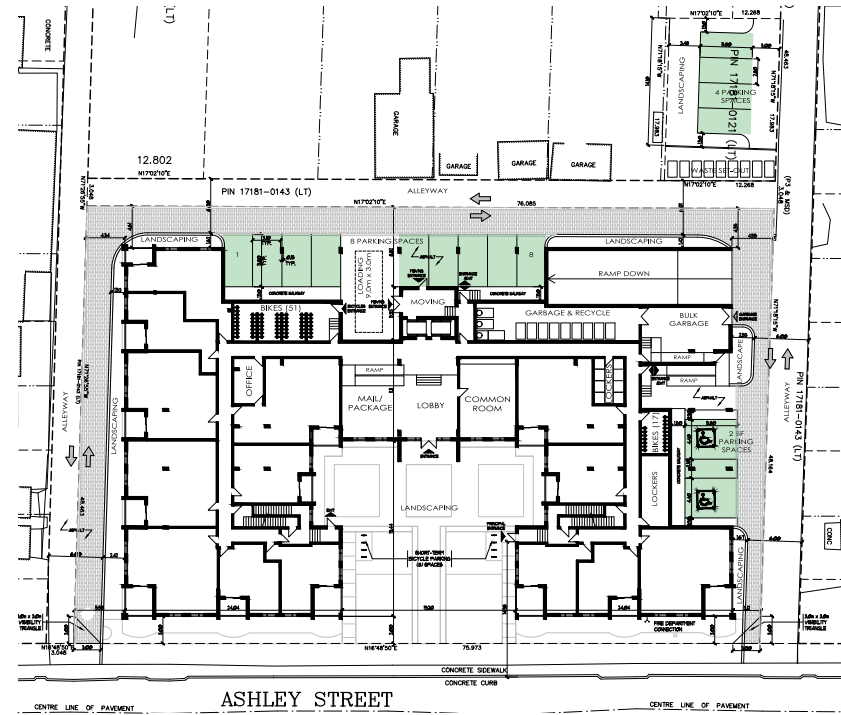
Floor plans showing at-grade and below-grade parking spaces
